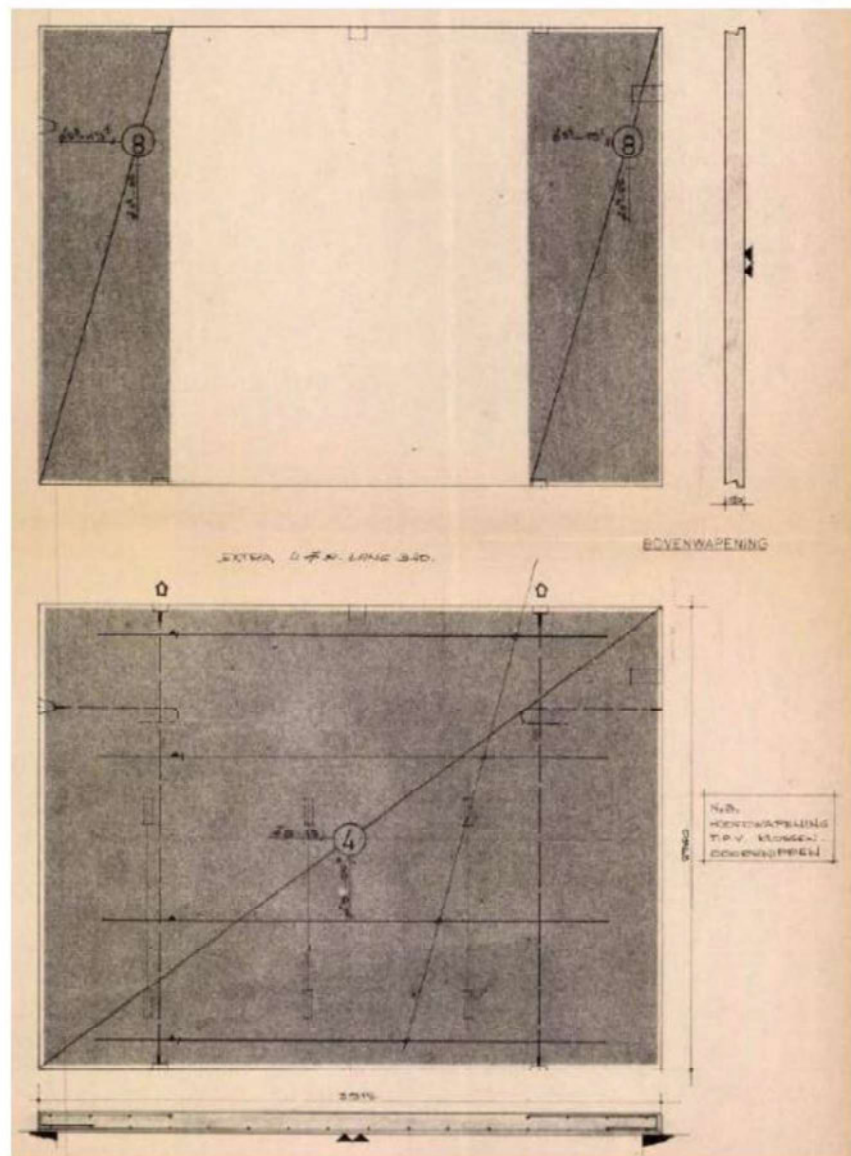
Technical drawings of the floor reinforcement for a building belonging to BETON1a typology; adapted from [Arup, 2016b].
